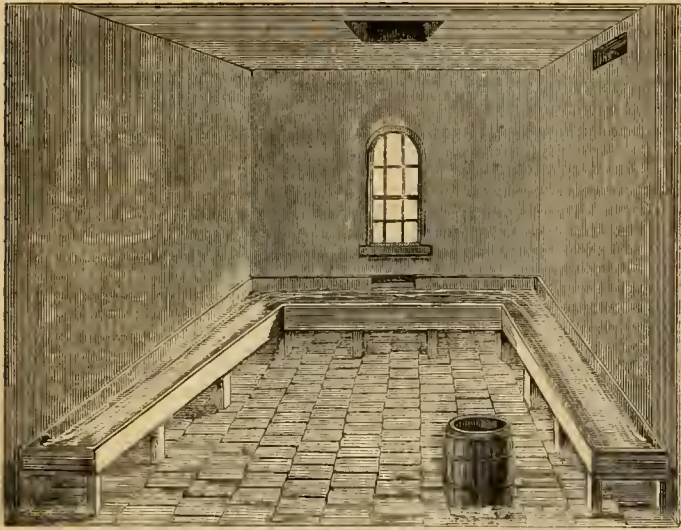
INTERIOR OF SPRING-HOUSE, WITH ELEVATED TROUGH.
